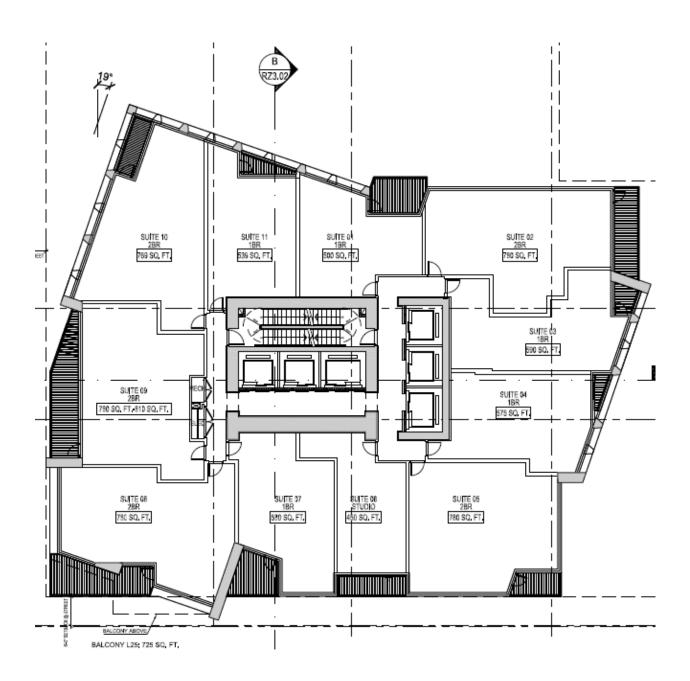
Tower A - Typical Floor Plan (Levels 9-25)
